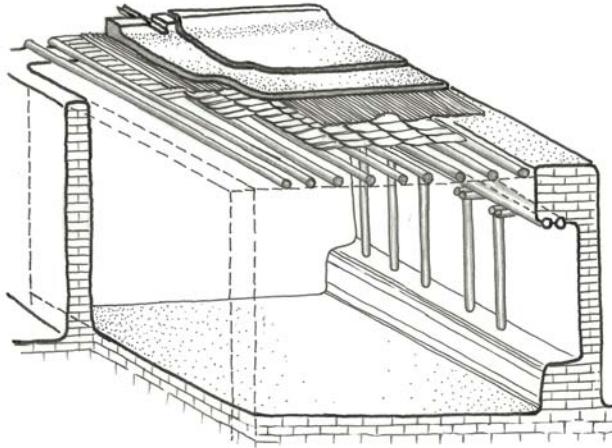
A Kabul typical traditional flat roof design. (Drawn by the author, adapted from Traditional Architecture of Afghanistan, p.186)
